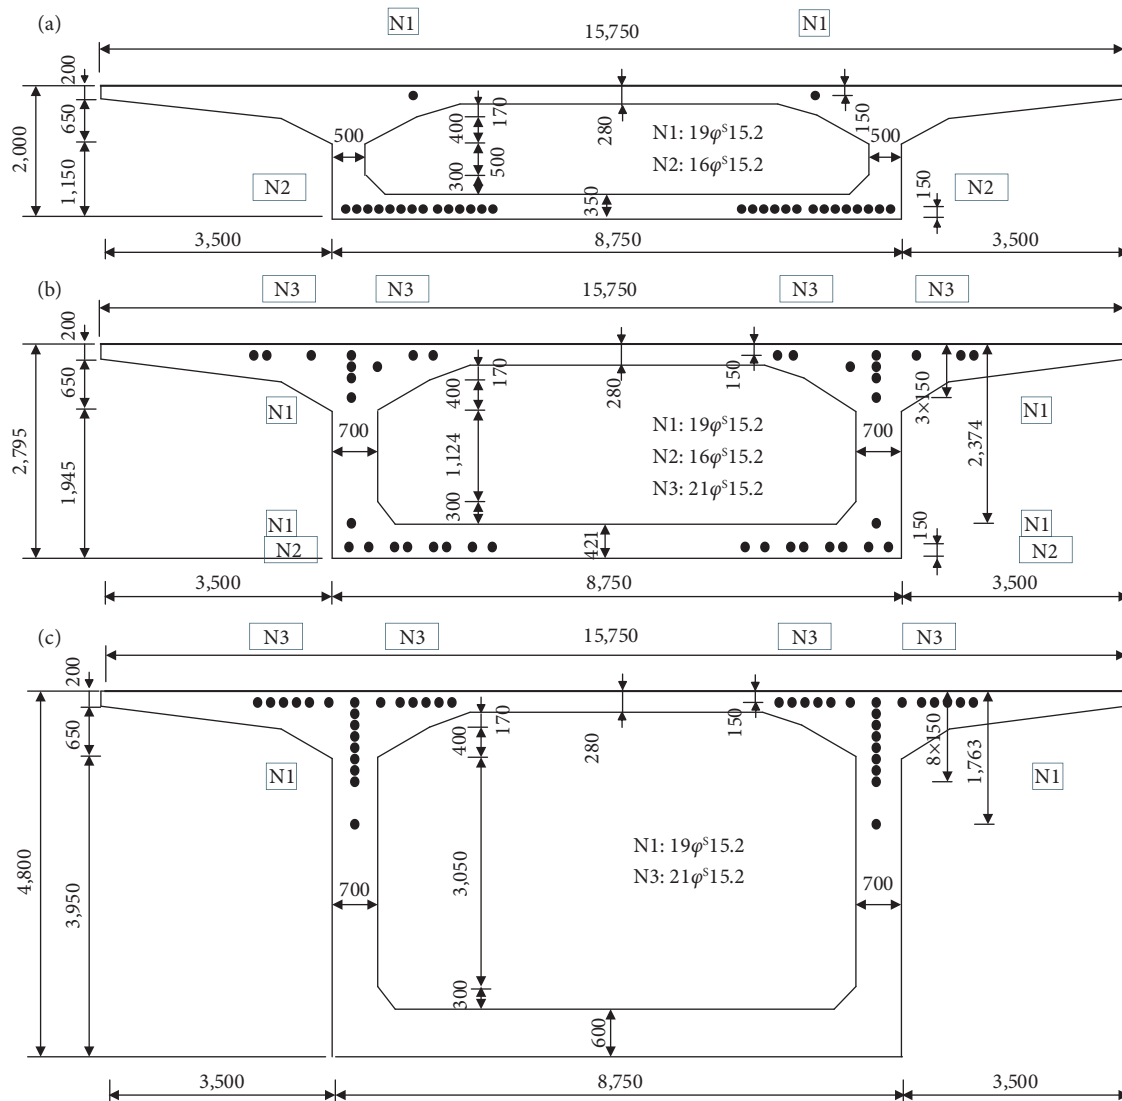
The tested bridge cross-section size and steel strand: (a) cross-section diagram at mid-span; (b) cross-section diagram at $L/4$; (c) cross-section diagram at $h/2$ from the support. (Unit: mm)
